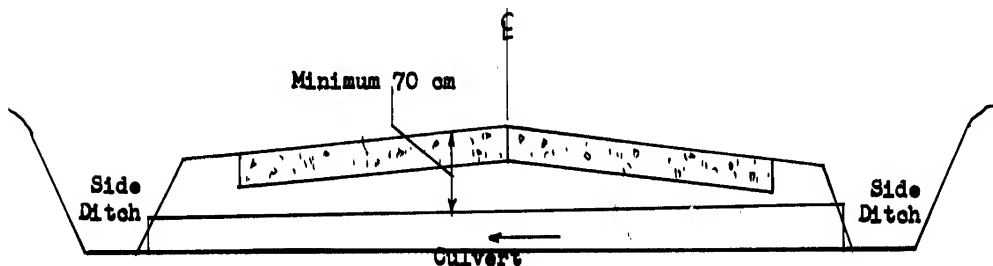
Concrete Drainage Pipe, Cross-Section View
